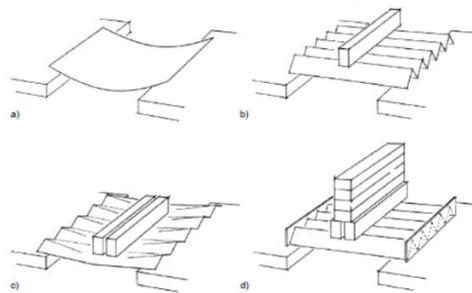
Stabilization of plates (Siegel, 1960)
